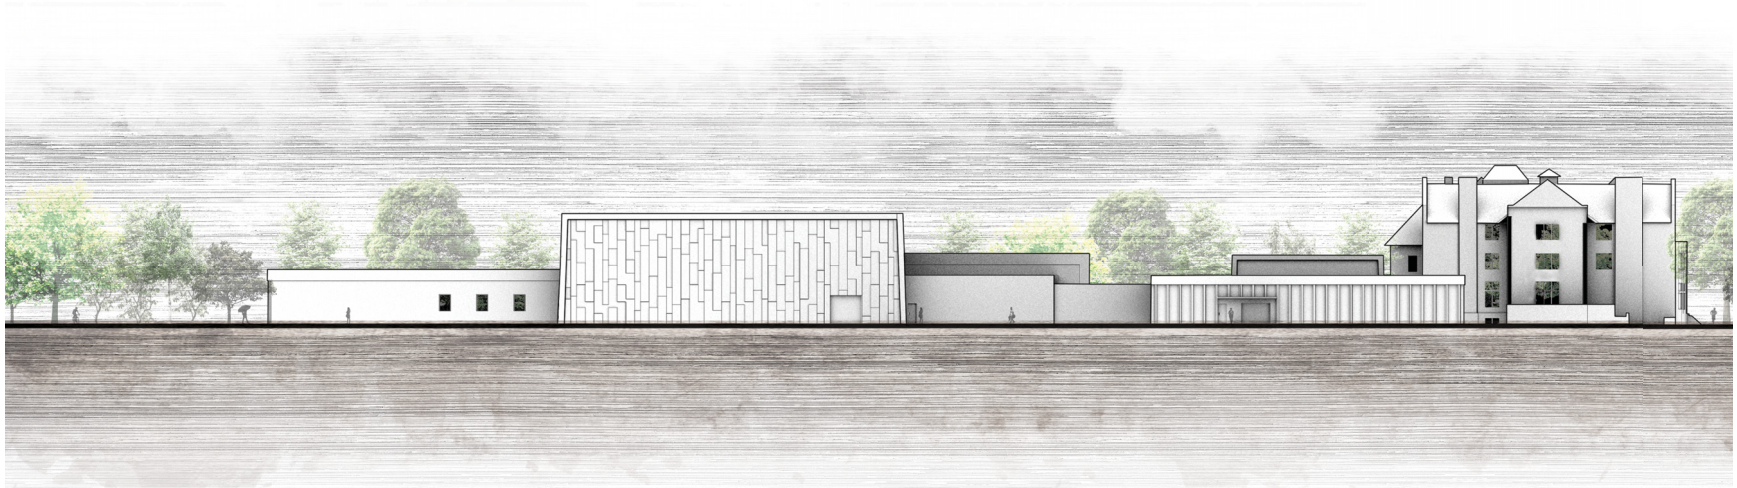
1:700 Existing West Elevations of the Royal Alberta Museum
